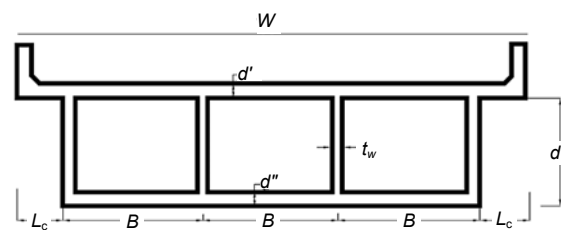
Cross section symbols for a prototype multicell box-girder bridge
